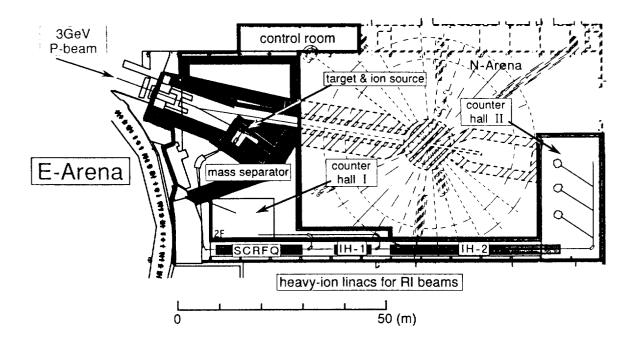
A plan of the new site for the E-arena in Tsukuba.
